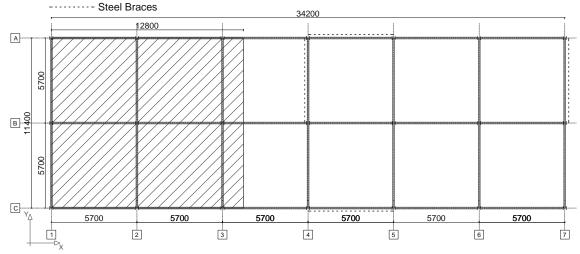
Floor Framing Plan - Symmetric Configuration (dimensions in mm).
